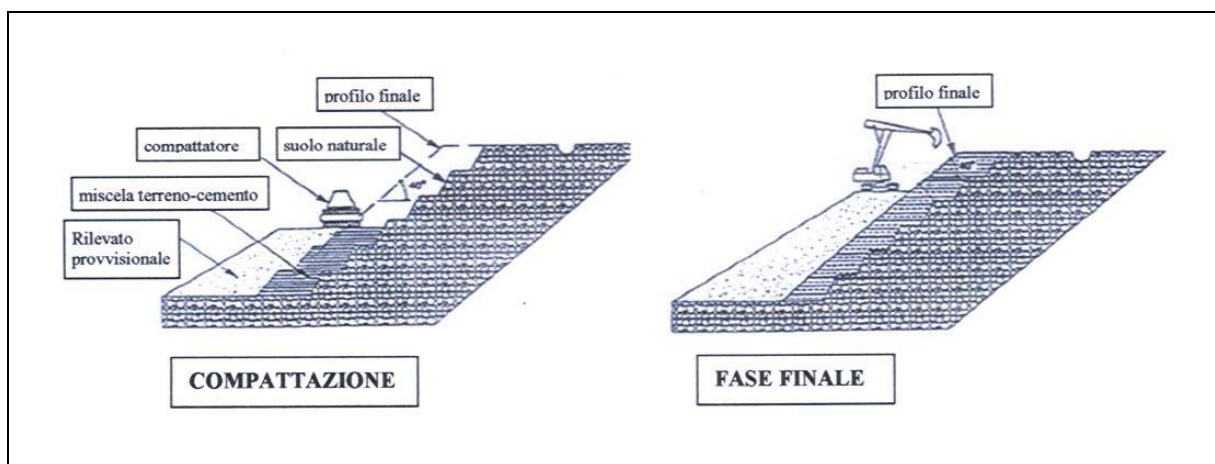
Construction procedure of compacted cement-clay mixture liner at the sidewall.
